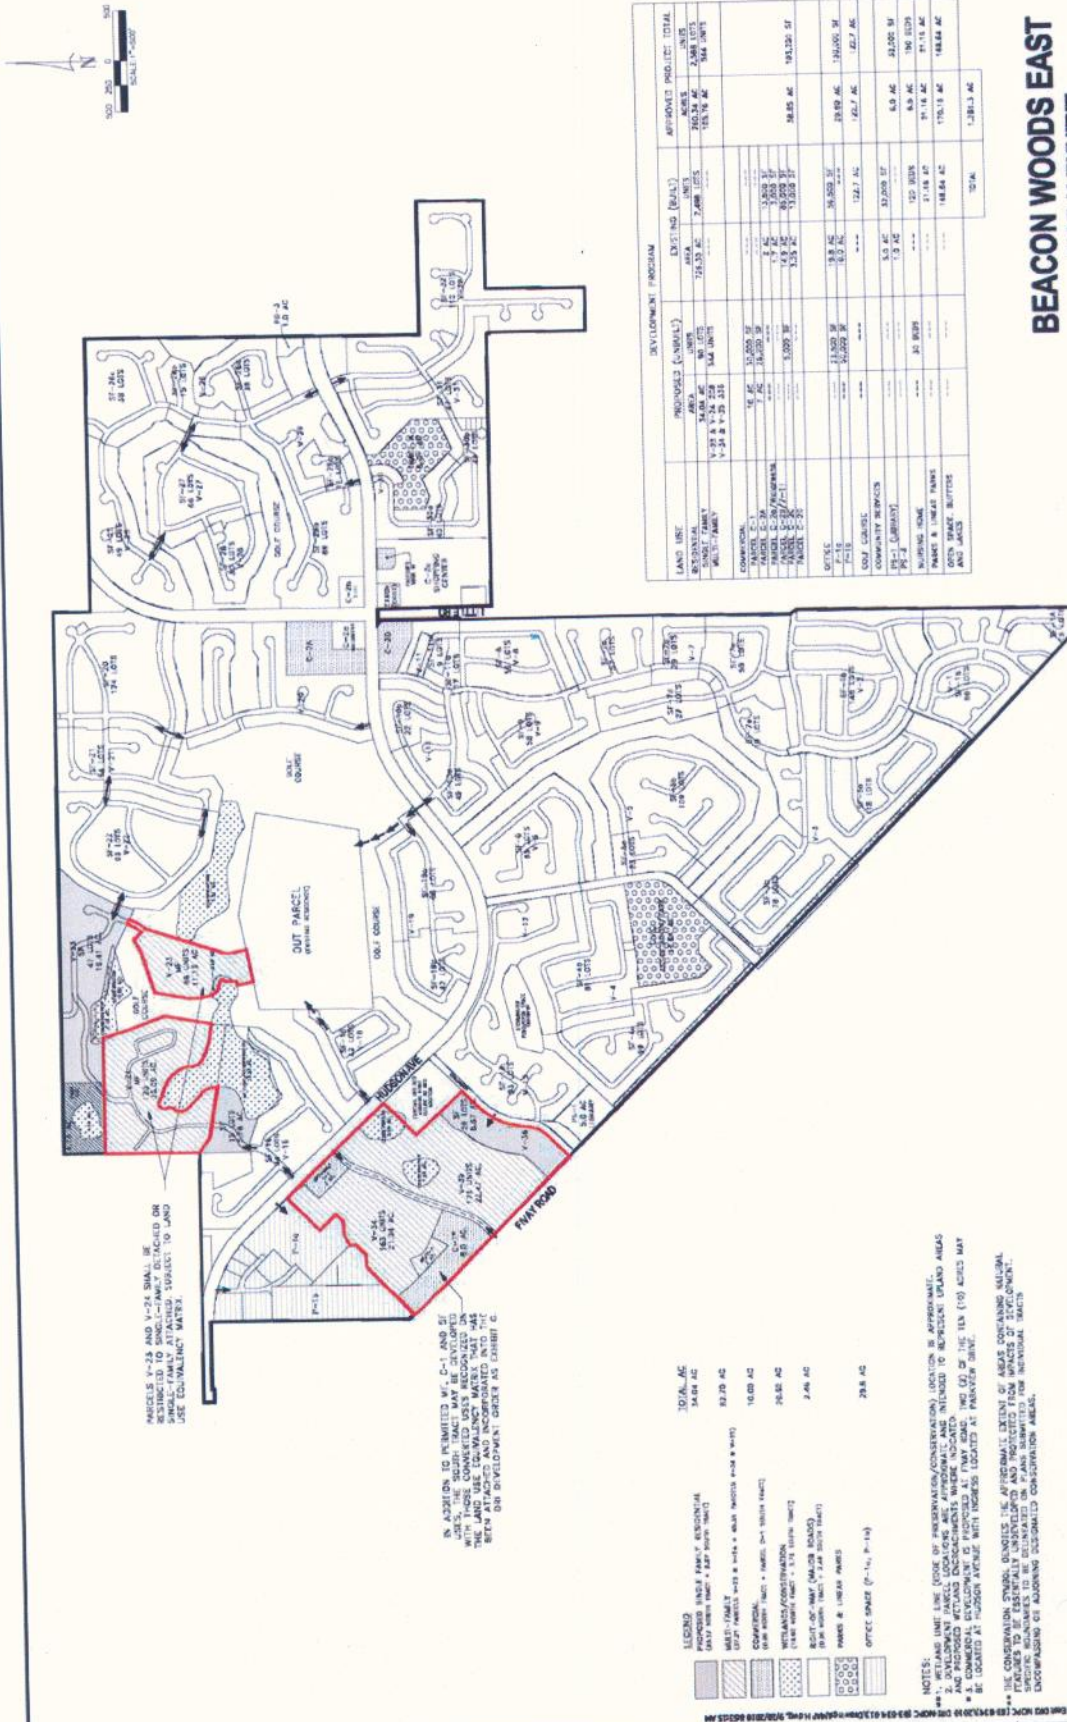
PROPOSED/REVISED MASTER DEVELOPMENT PLAN (MAP H)
